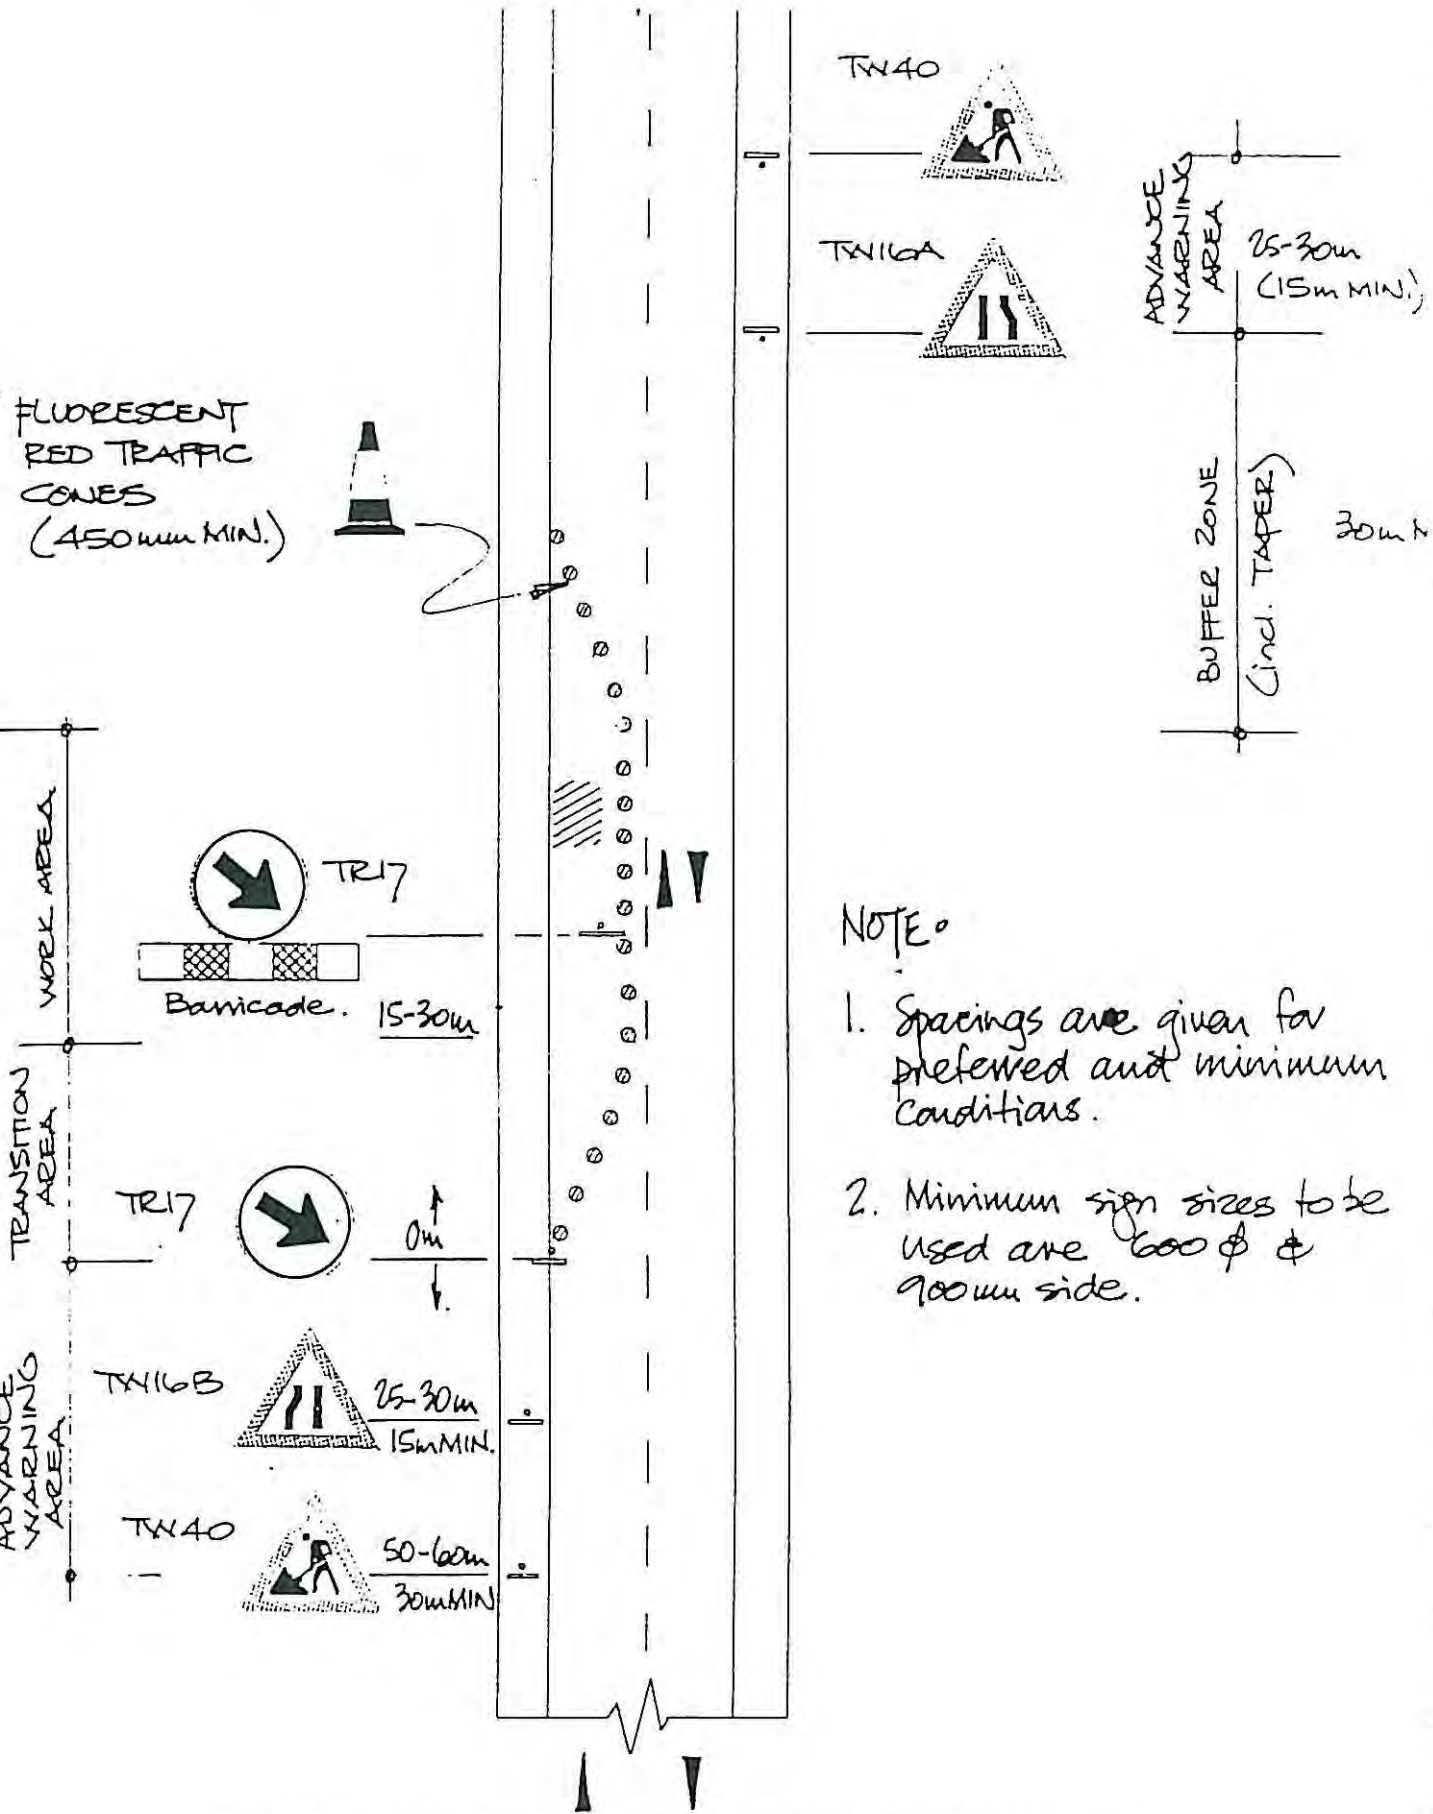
TYPICAL LAYOUT OF ROAD SIGNS FOR ROADWORKS
